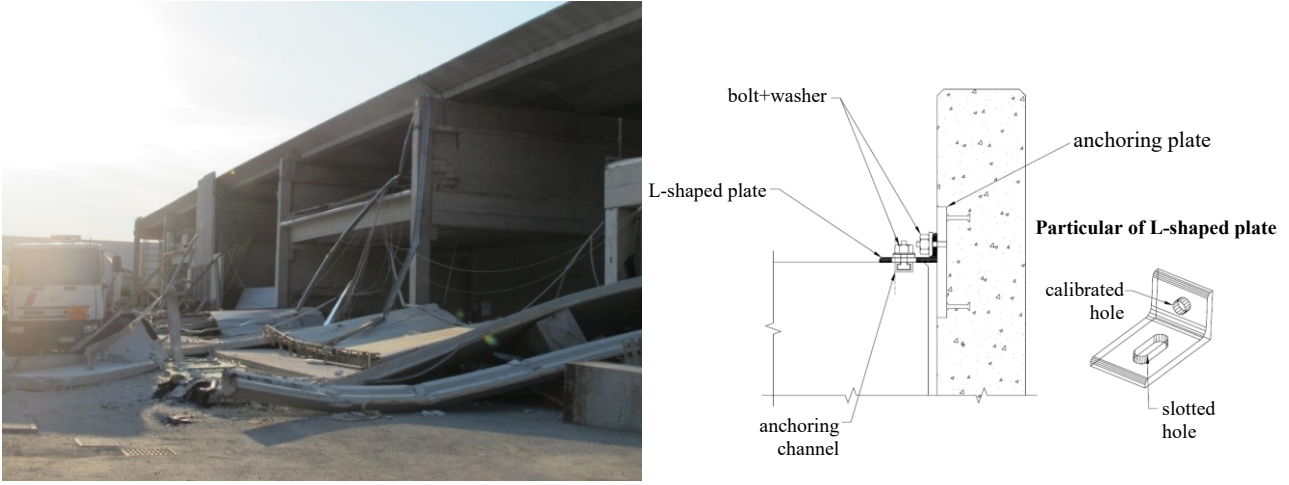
Vertical cladding panels: (a) example of a collapse and (b) details of the connections, adapted from [48].
